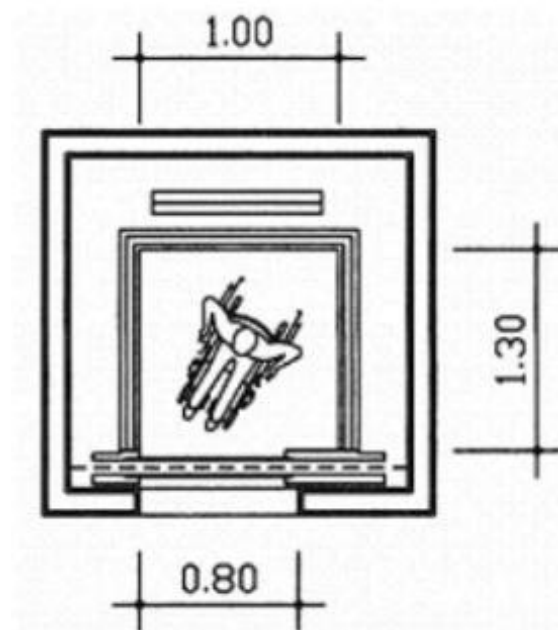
showing the minimum internal elevator dimensions, Allowing for one wheelchair passenger alone
